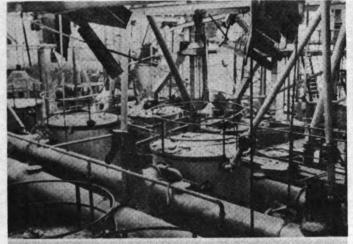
View showing superficial damage to dldg. K - gas generating building. Very little damage was sustained by the equipment.
